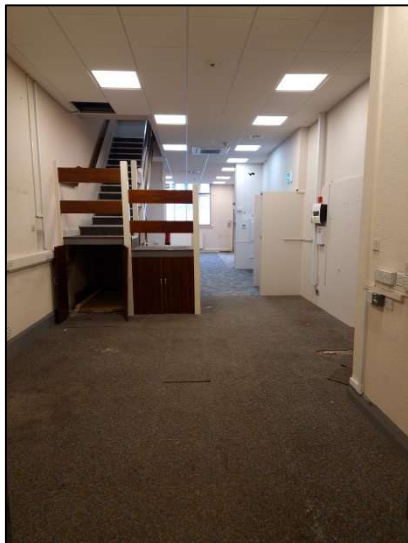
2nd Floor Room, Located within Gable, Looking (E)
